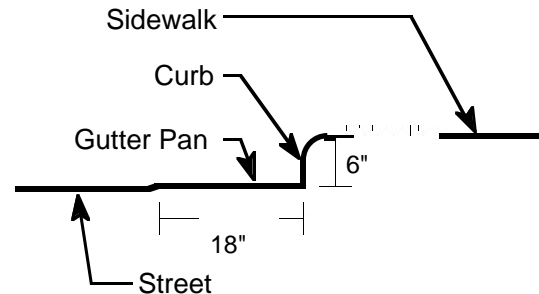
shows a typical curb and gutter pan. In this drawing the longitudinal joint between the street and the gutter pan is shown to be uneven, which is how the gutter pan is typically constructed. The City of Boulder, however, will work to ensure that the gutter pan is constructed without an uneven longitudinal joint.
